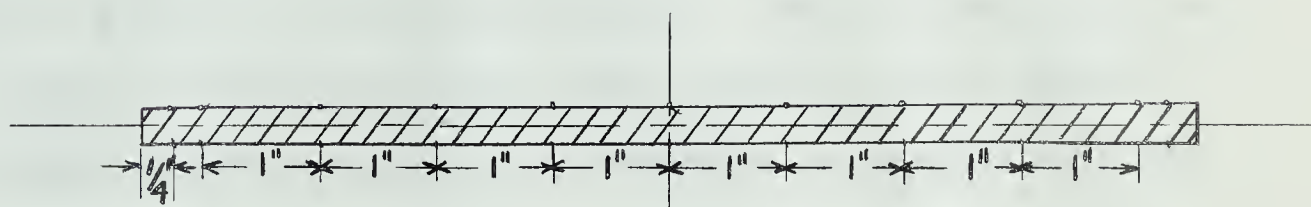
(a). Diametric Section of the Plate, showing the Location of Thermocouples for the Simply Supported and Clamped Circular Plates.
